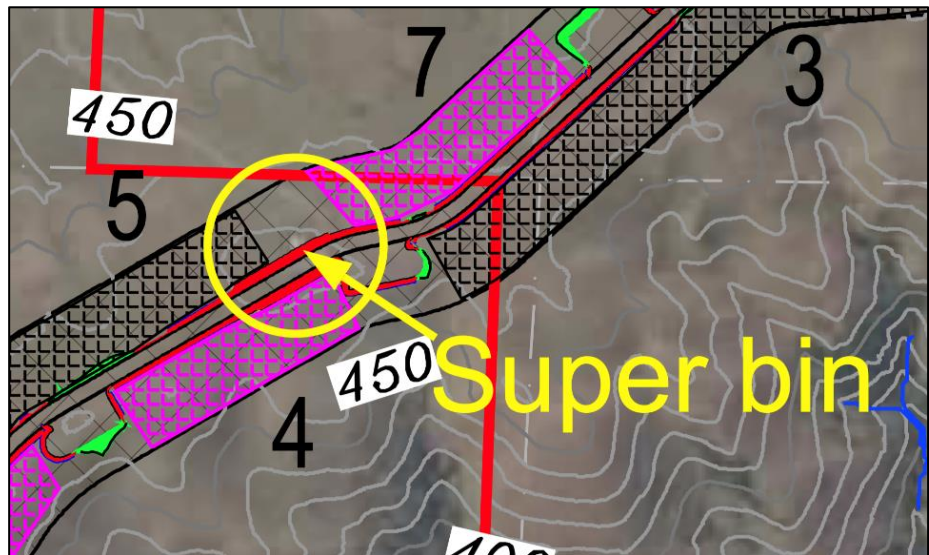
Potential 'cut batter slope' on Updated Fill Plan
